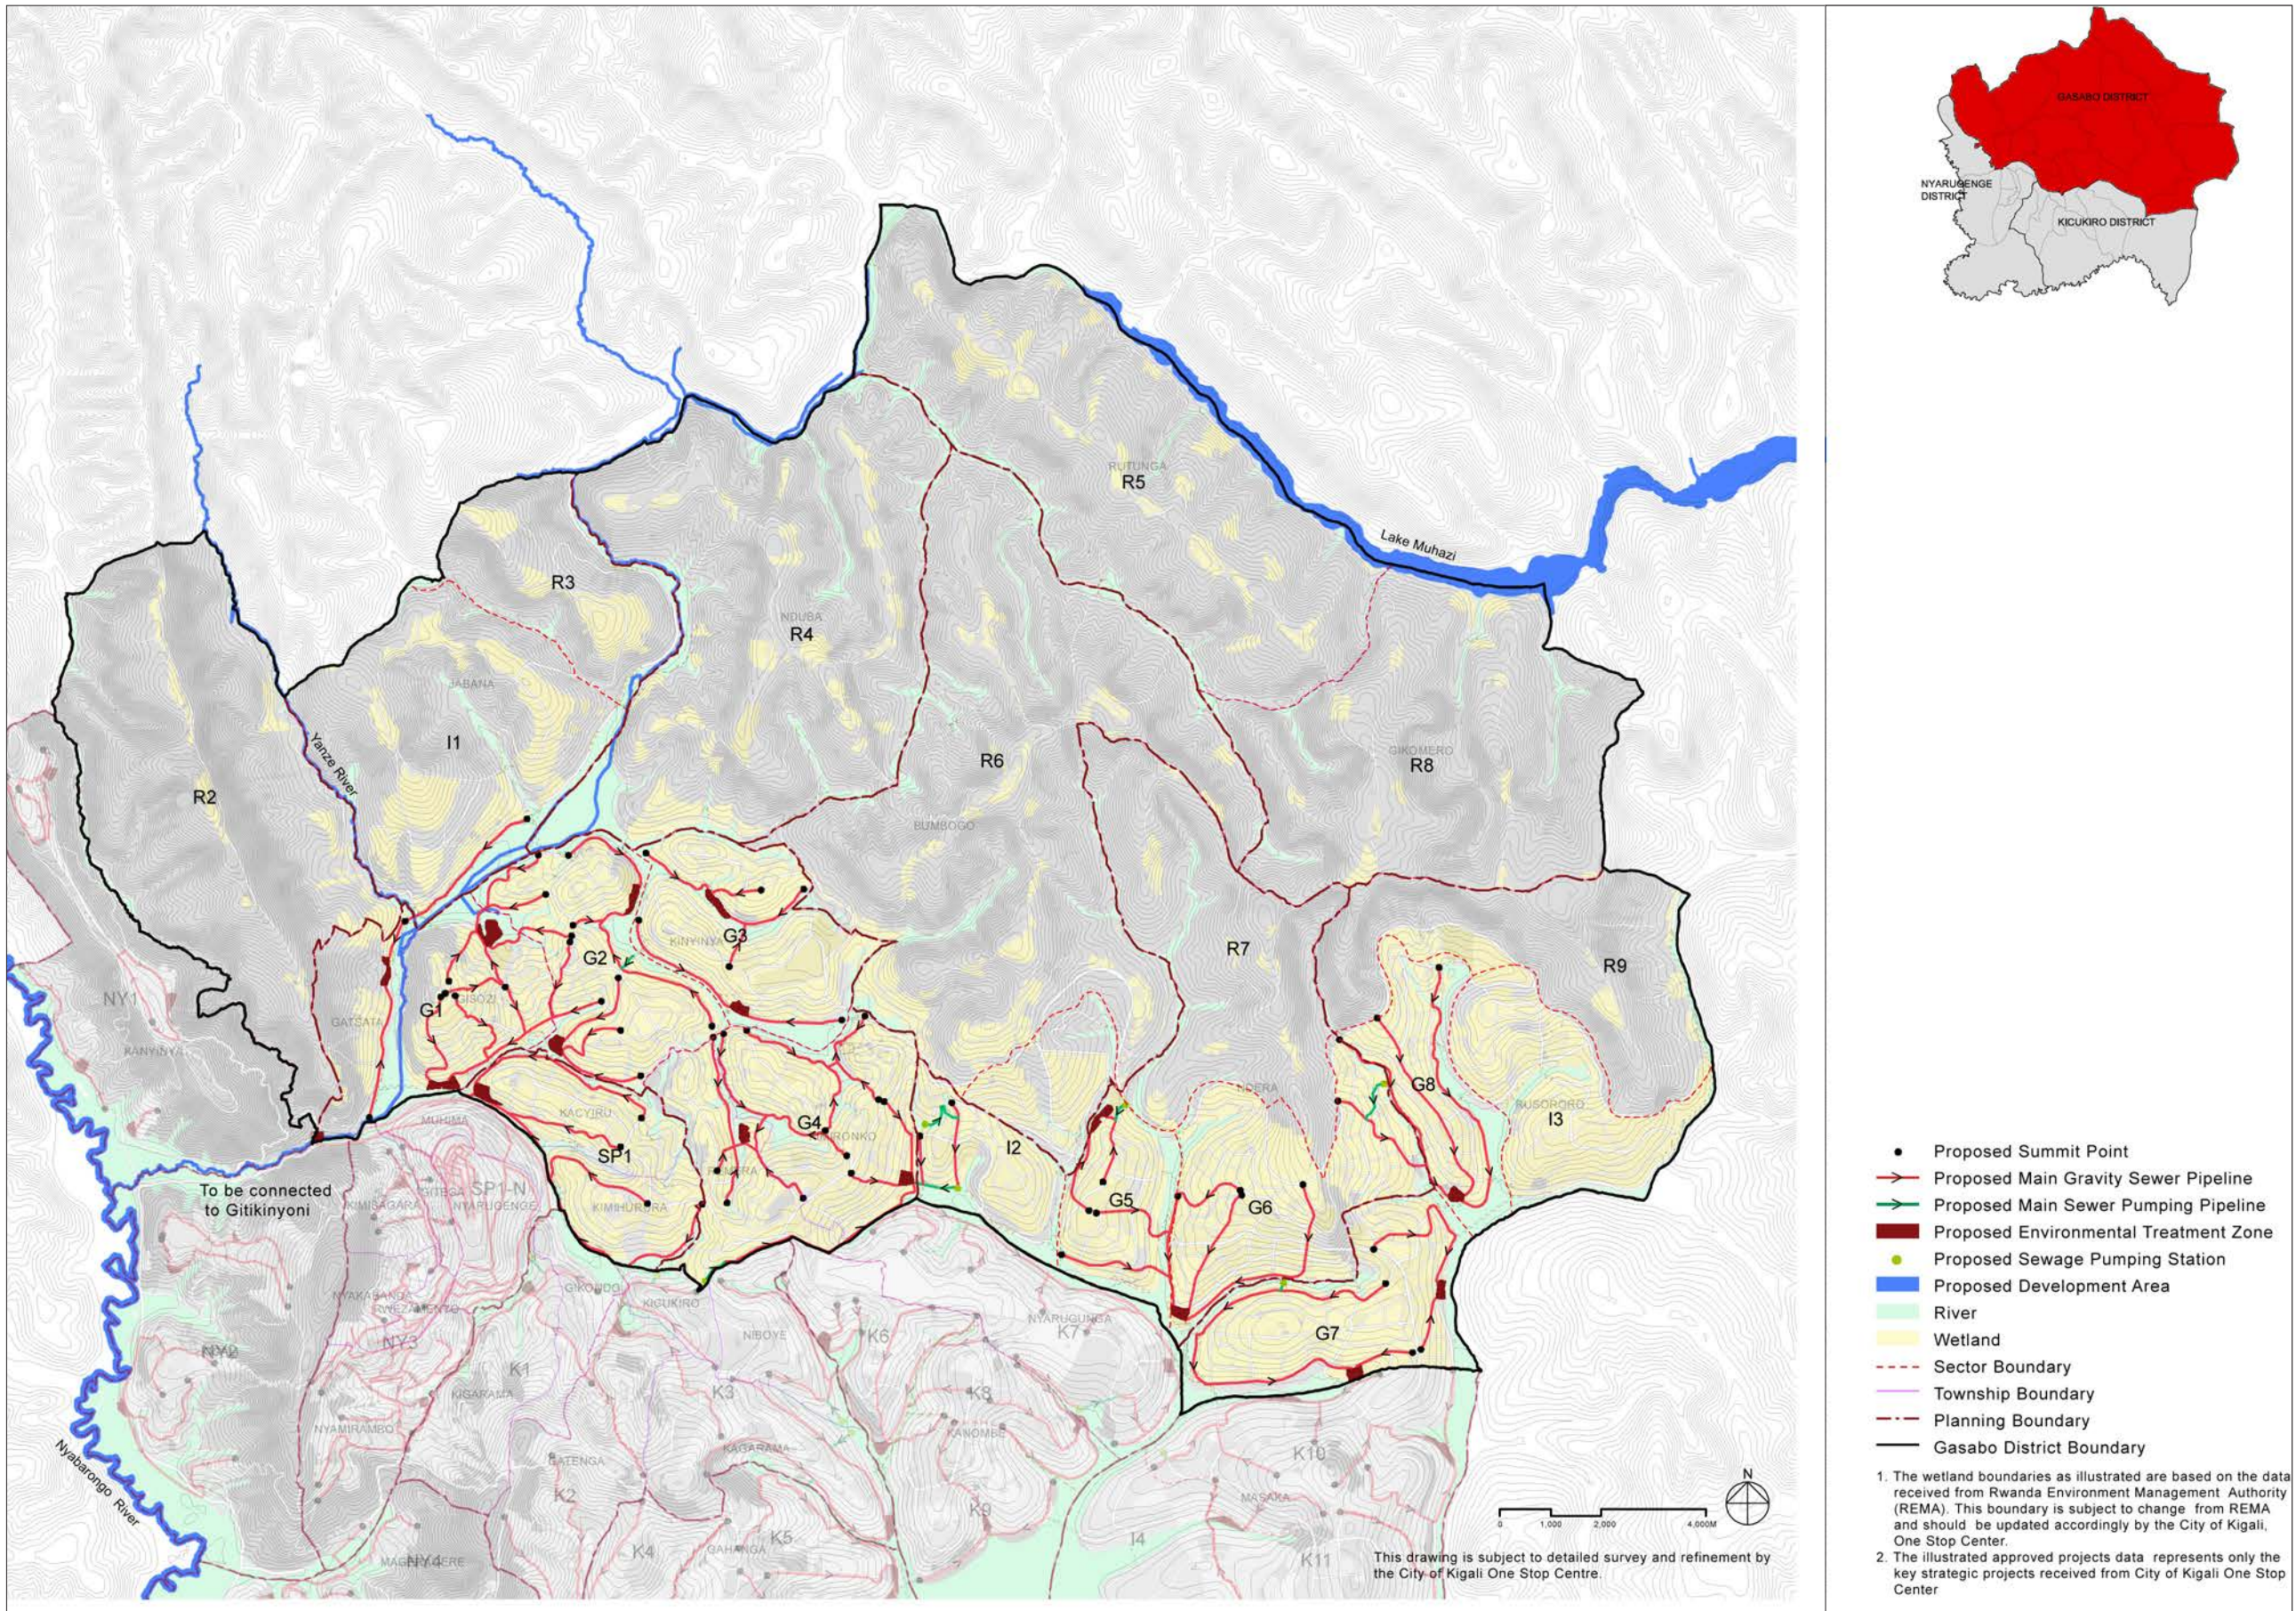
Gasabo District - Proposed Sewerage Plan Year X
